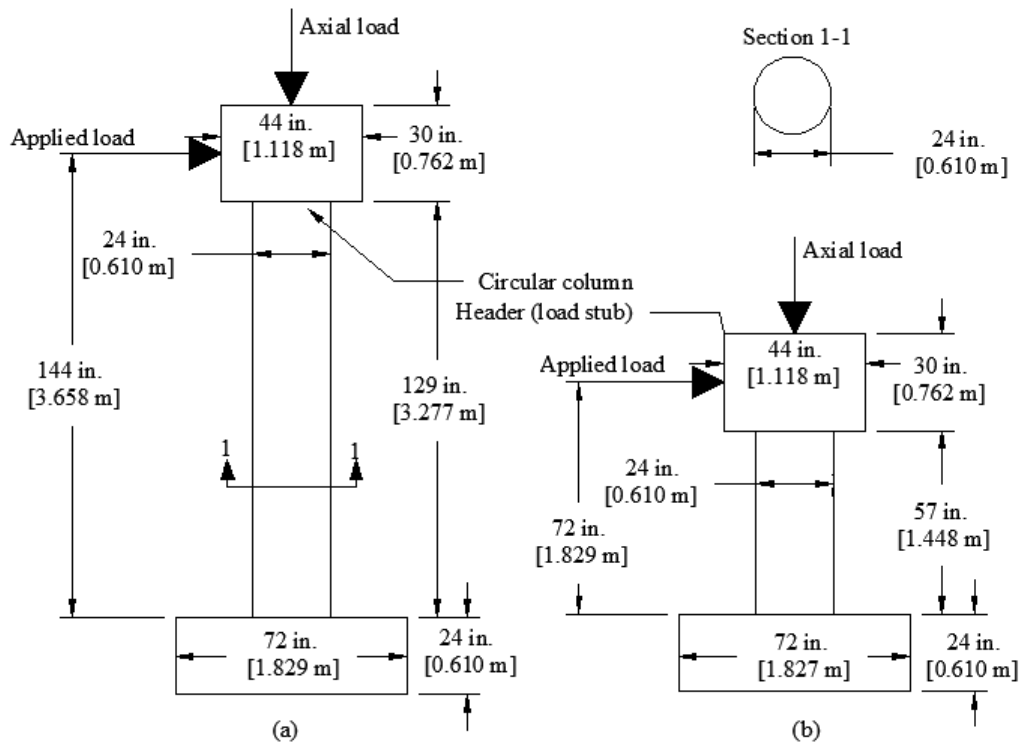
Test elevations for: (a) columns C1 through C4 and (b) columns C5 and C6
